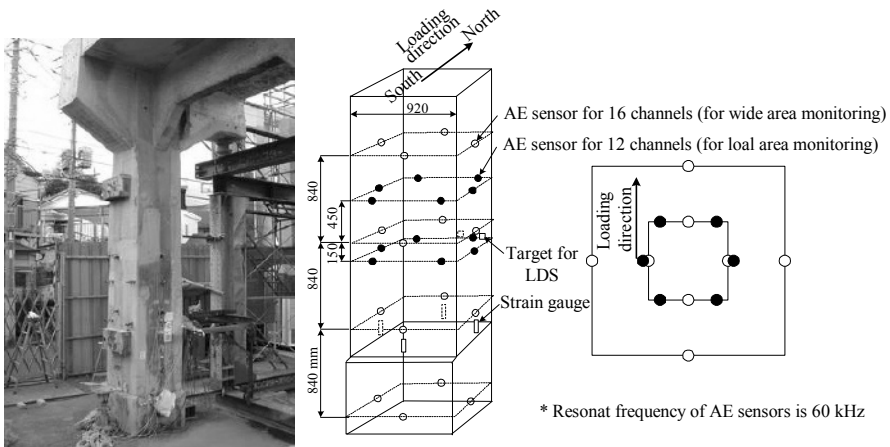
Photo of measured railway pier of reinforced concrete (left) and sensor array (right).
